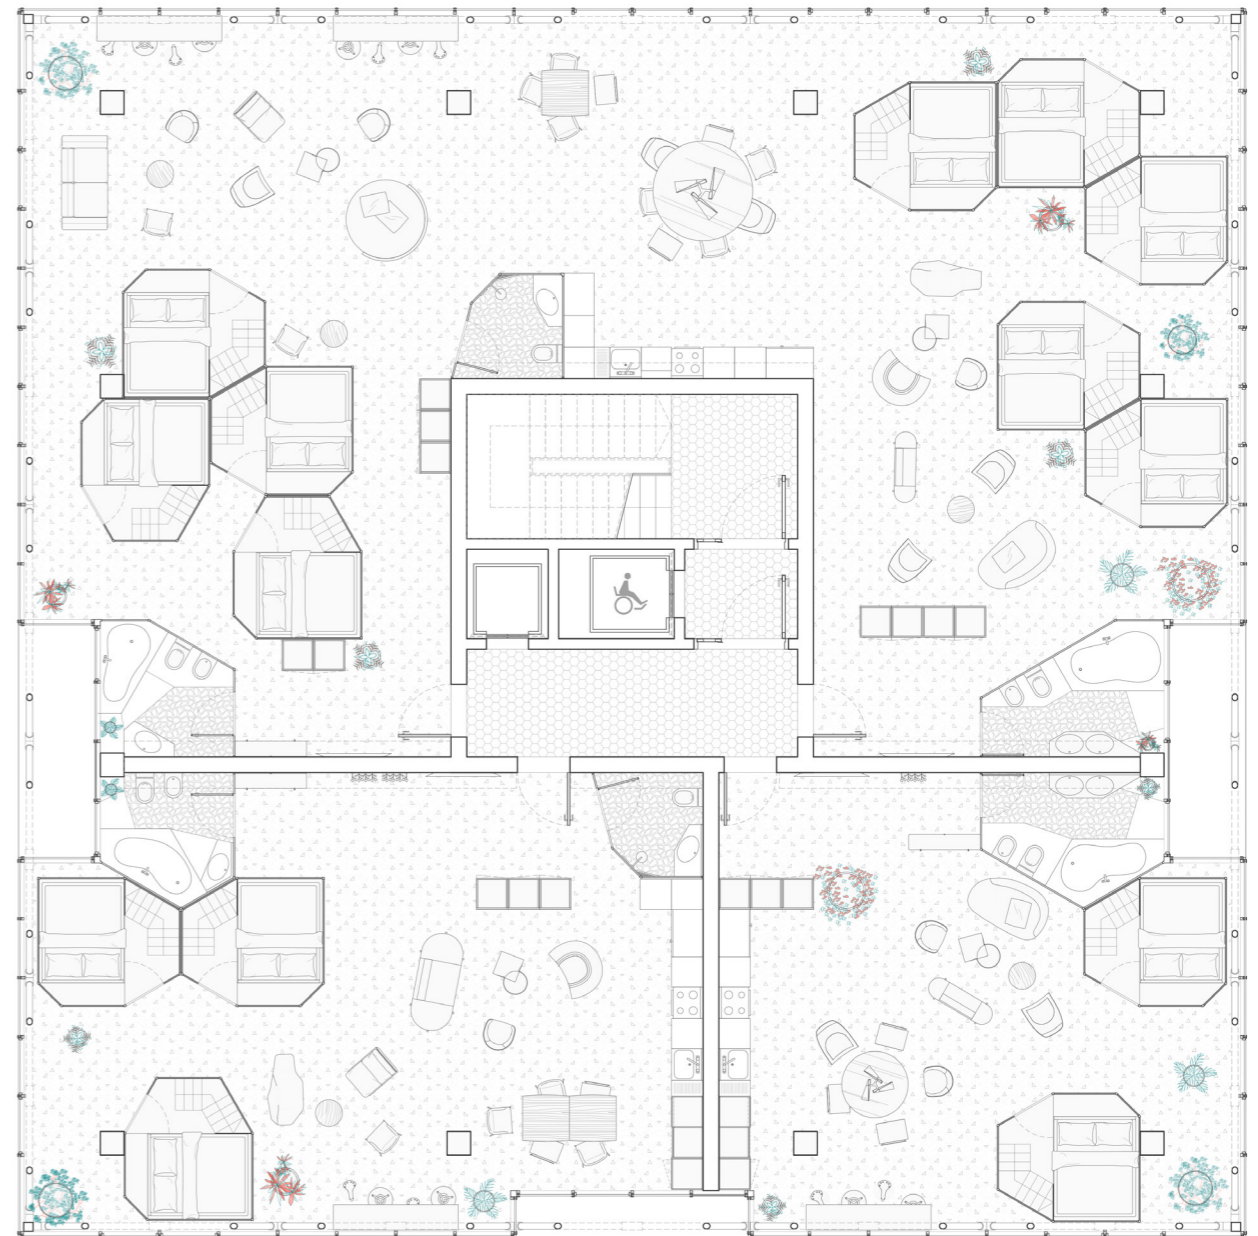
Type 4 - Dwelling Units Floor Plan, variation 2 (levels 19-20)
